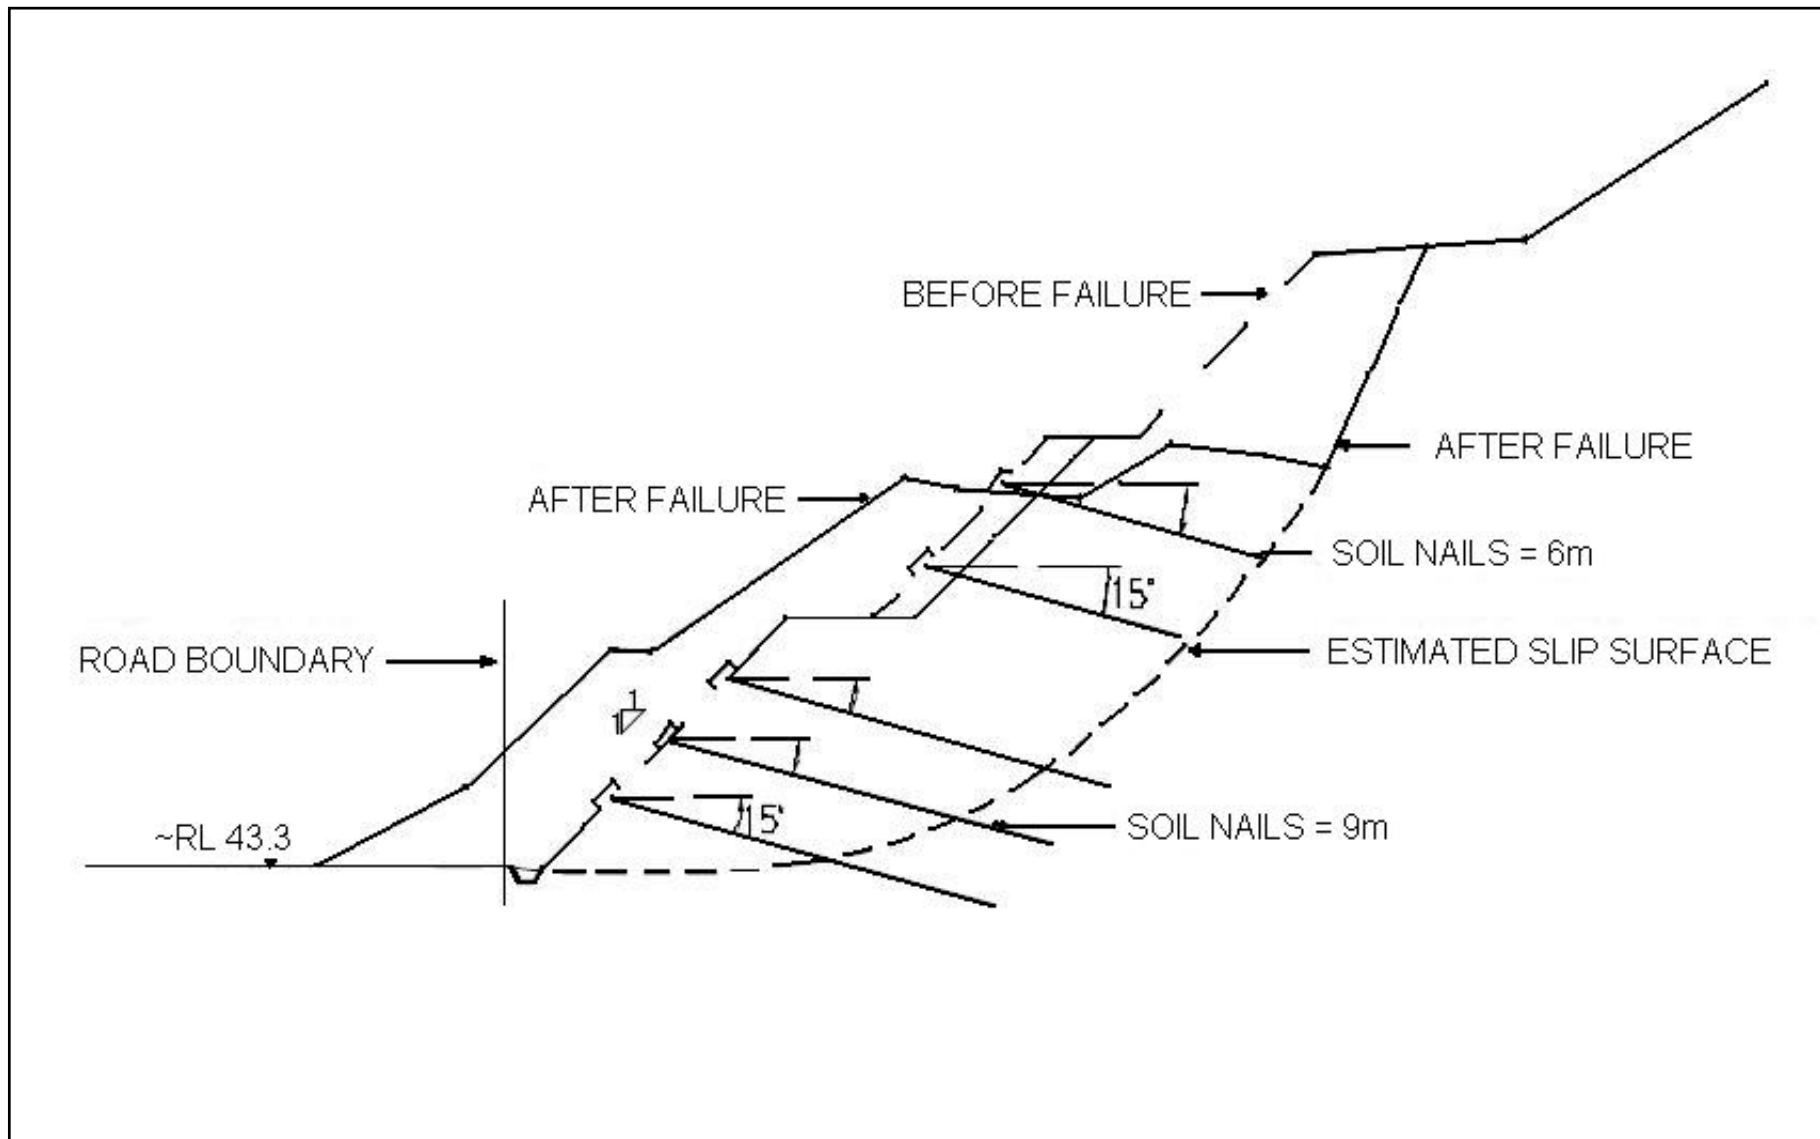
Cross Section of the 18 m High Soil-nailed Slope (Extracted from Chen(2004))
